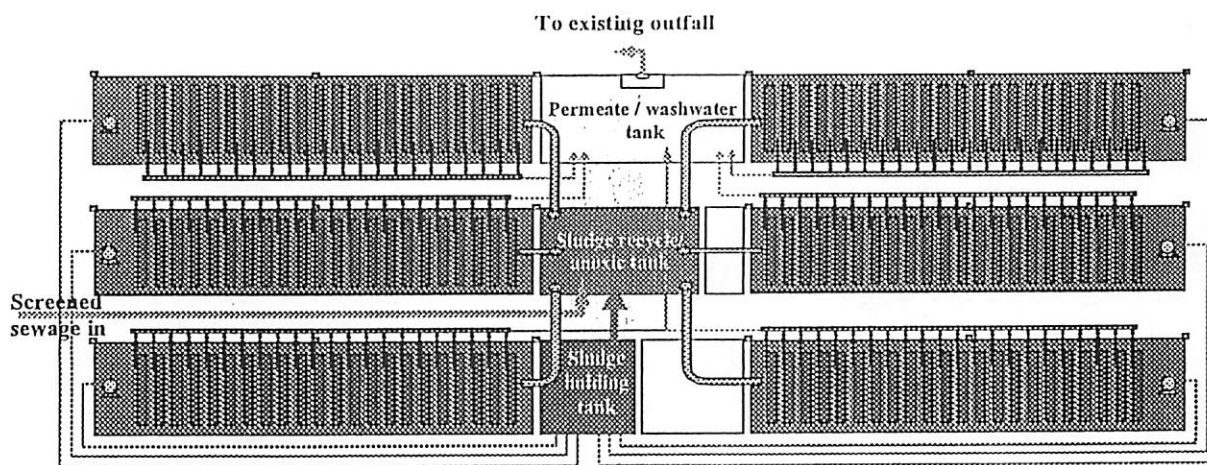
Schematic layout of the Swanage sewage treatment plant building
